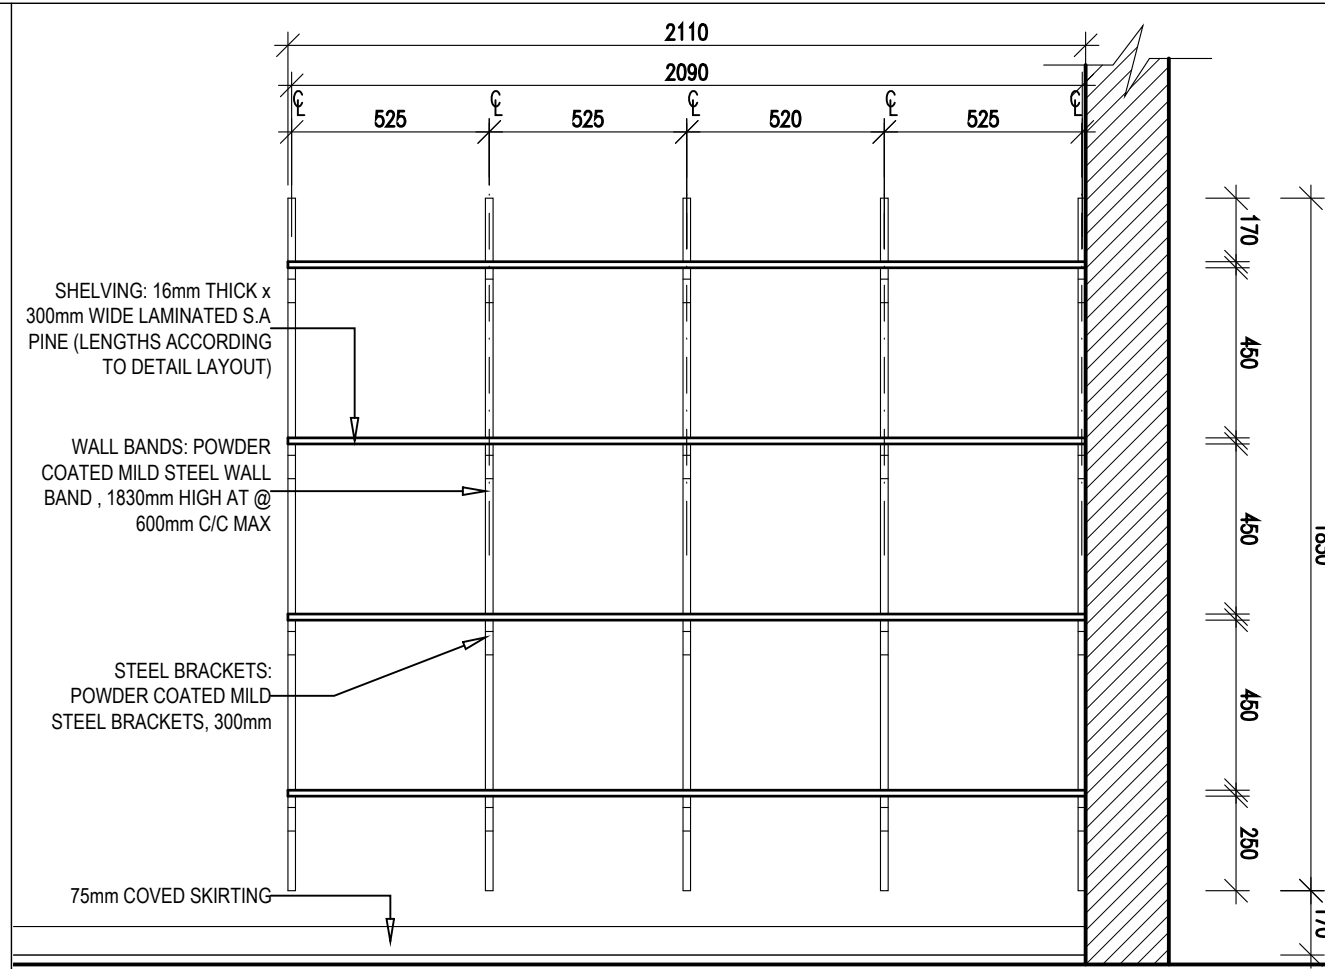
SECTIONAL ELEVATION B SCALE 1:20
